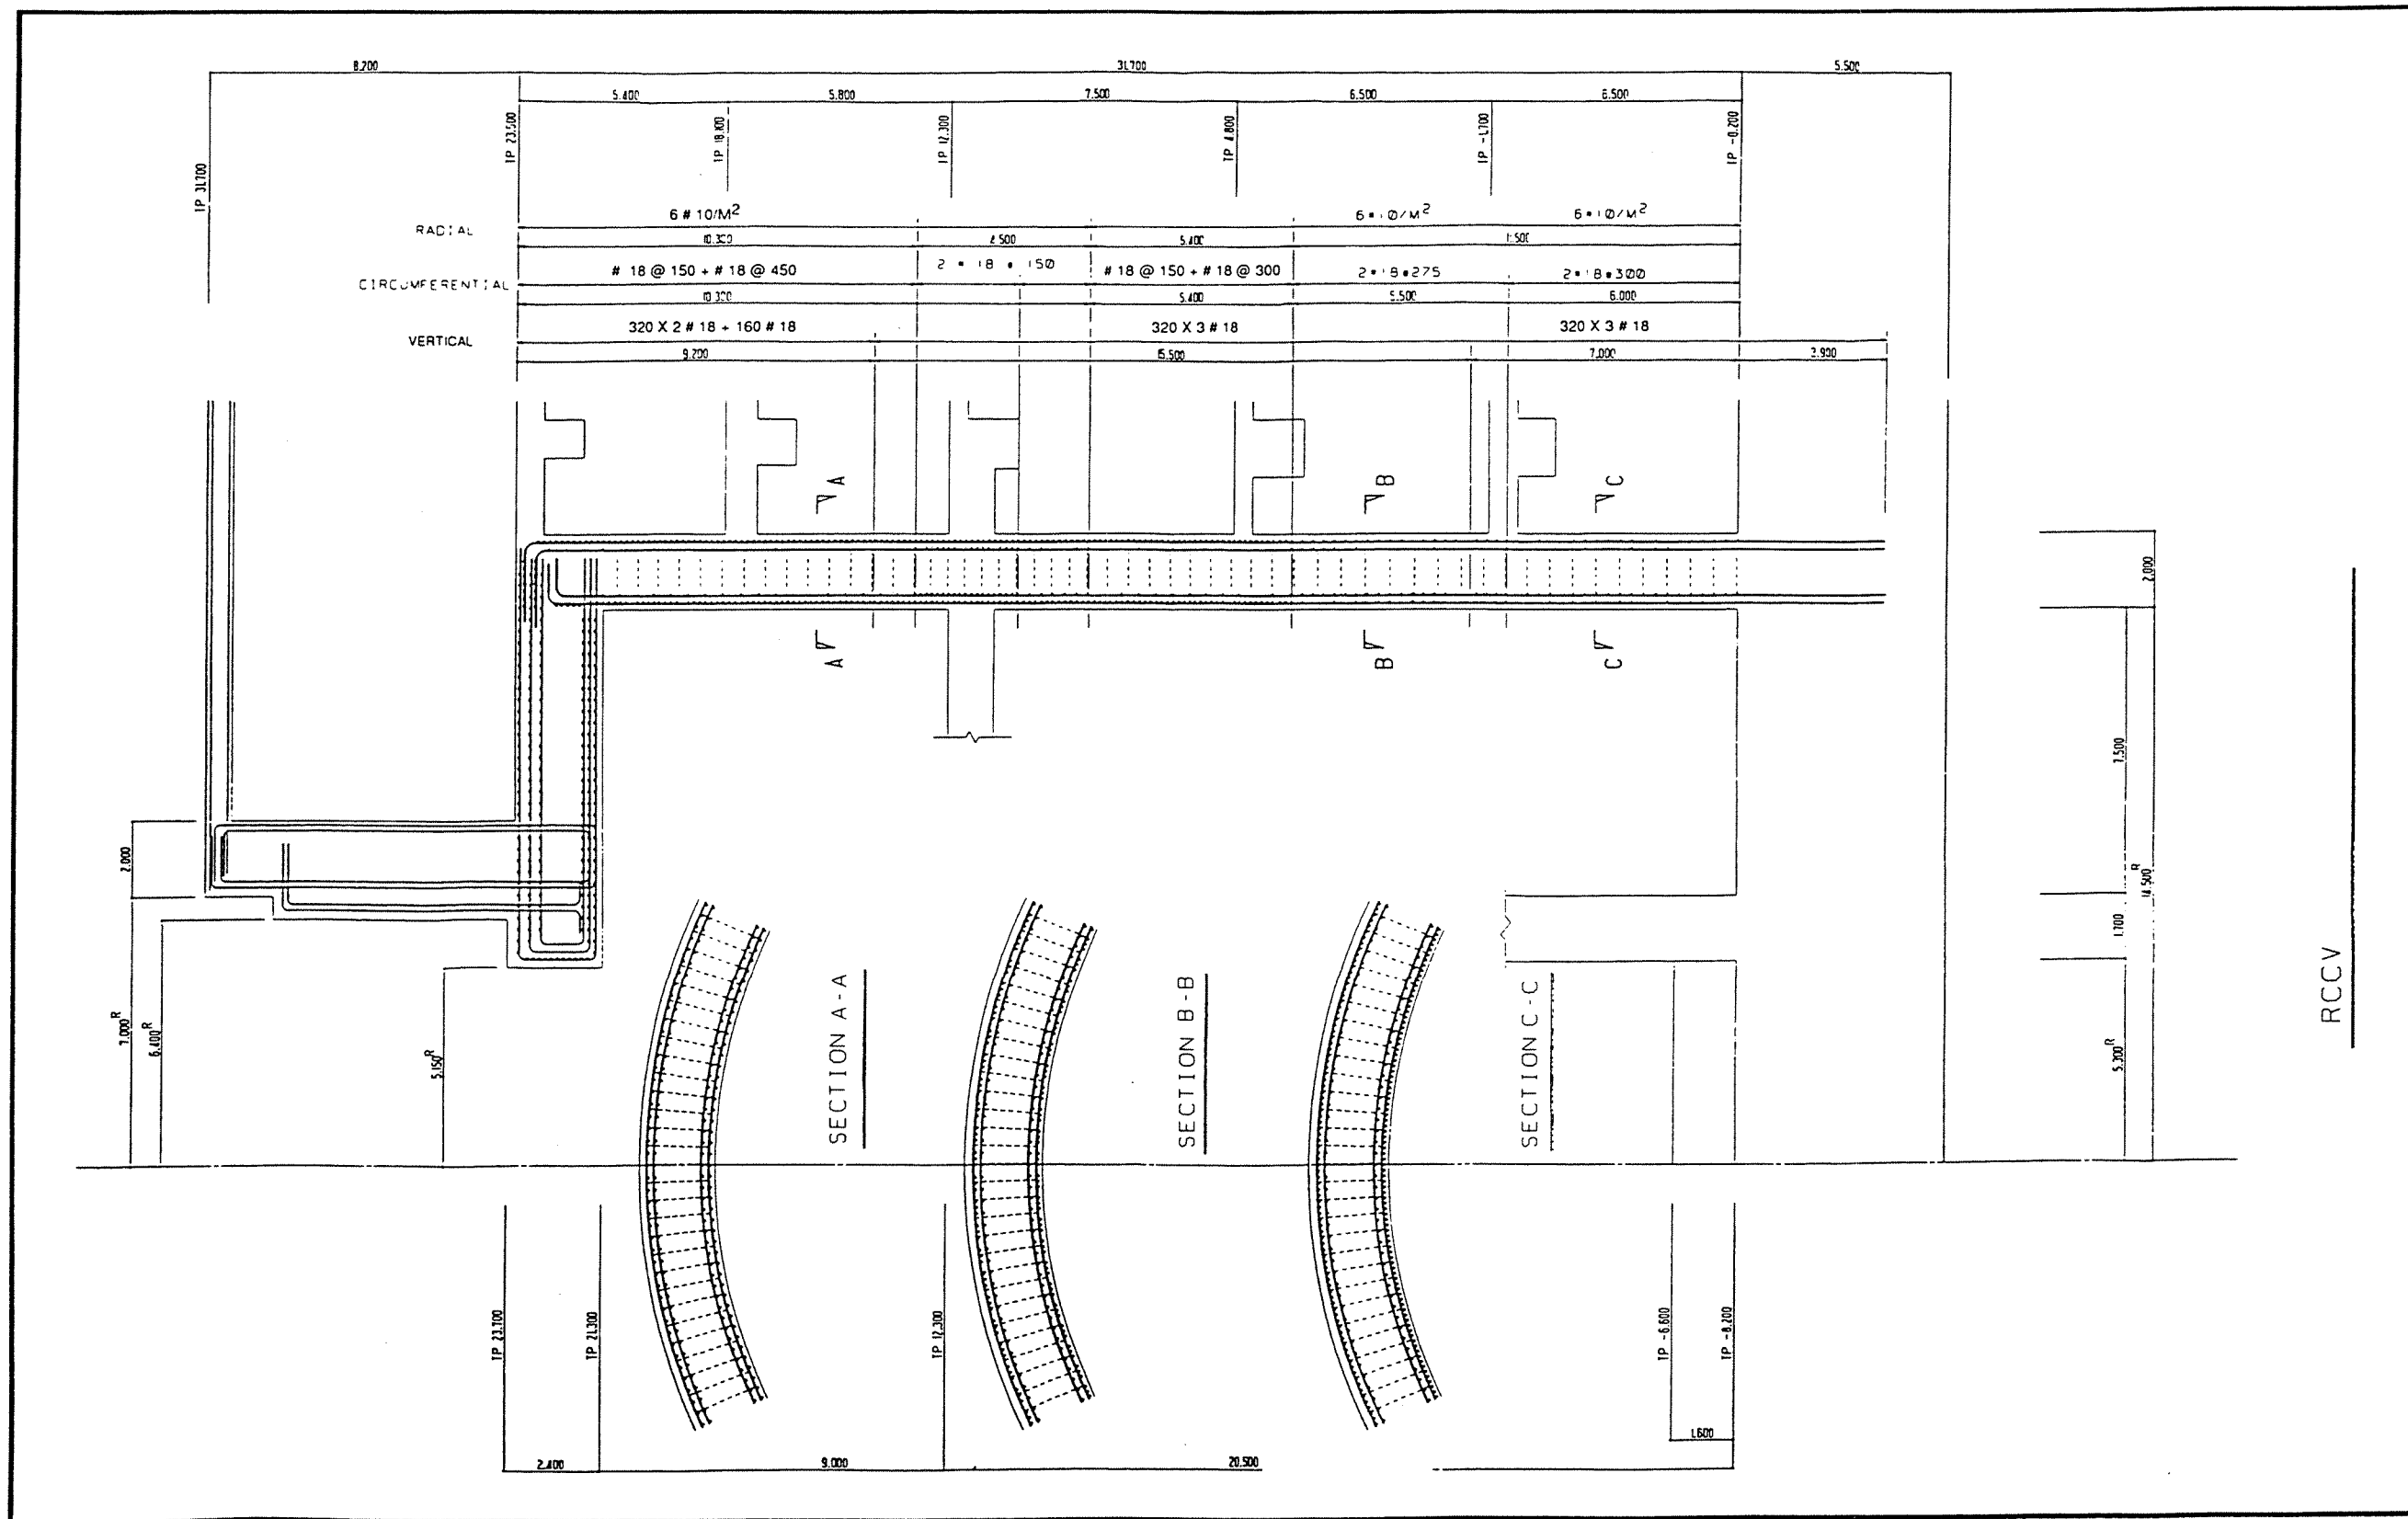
H.1-30 CONTAINMENT STRUCTURE WALL REINFORCEMENT
